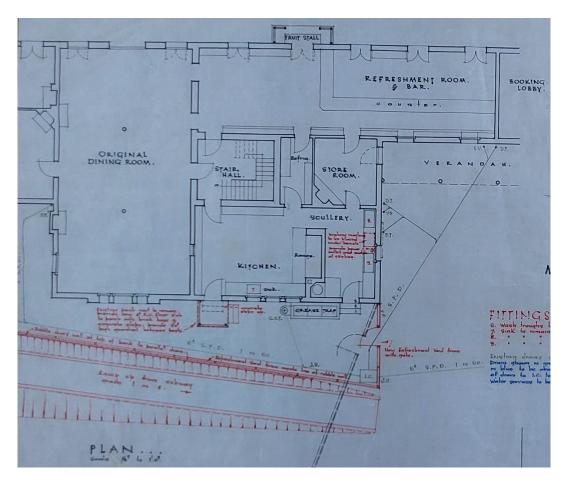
Plan drawing of the ground floor of the 1888 station extension in 1960
